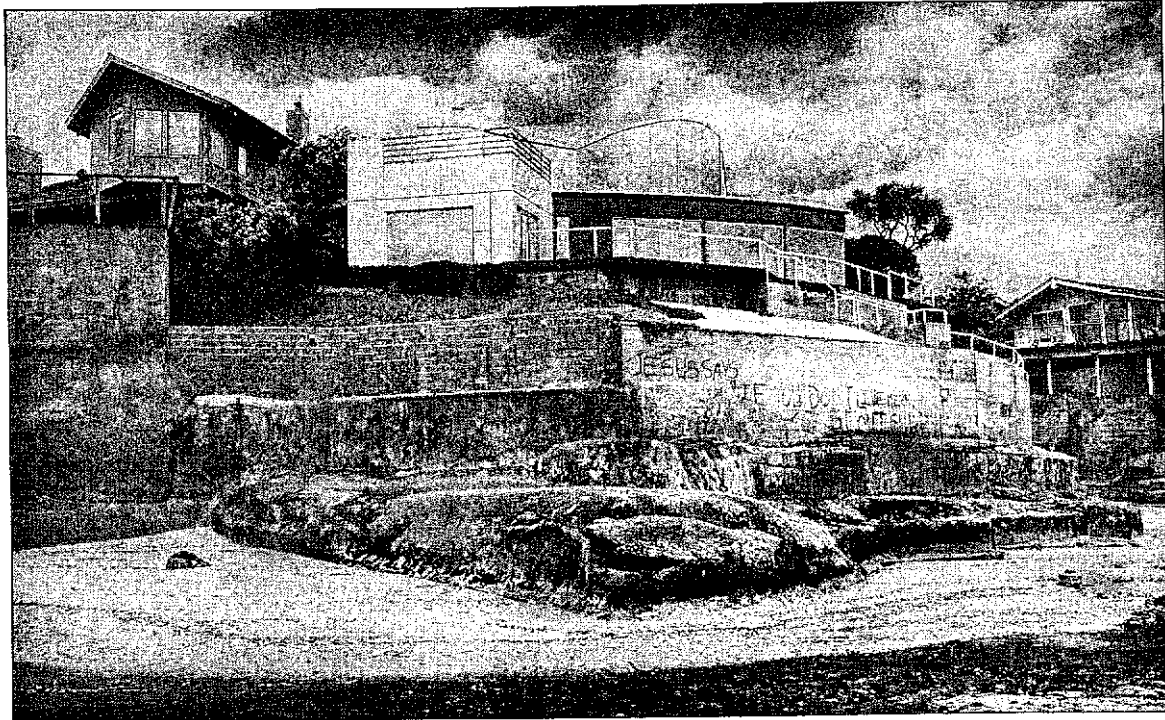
Proposed Porter House, south elevation. *Photo visual by ArchiGraphics.
